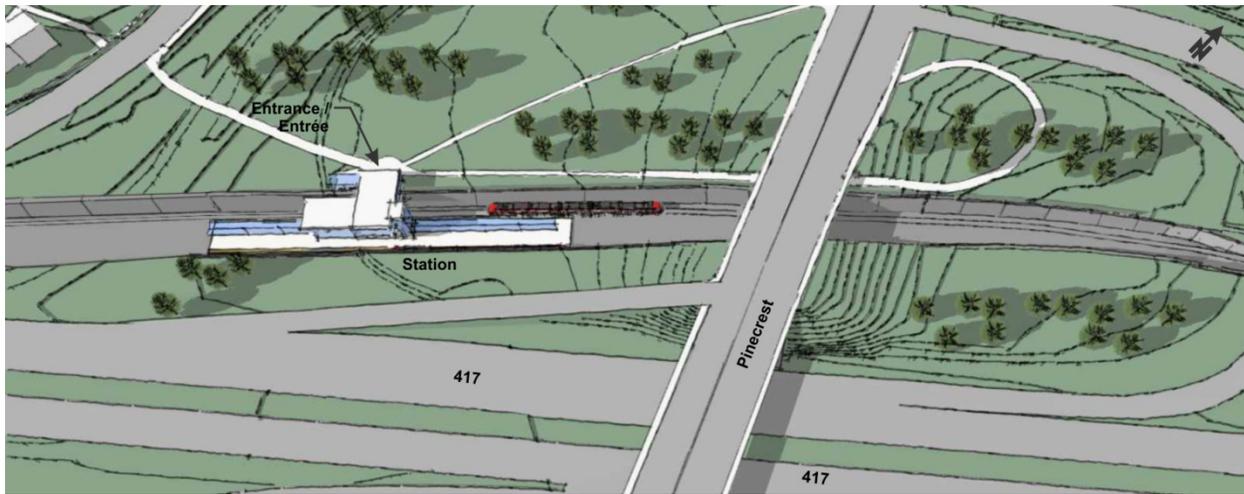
Plan view of Pinecrest Station north of Highway 417 and west of Pinecrest Avenue
